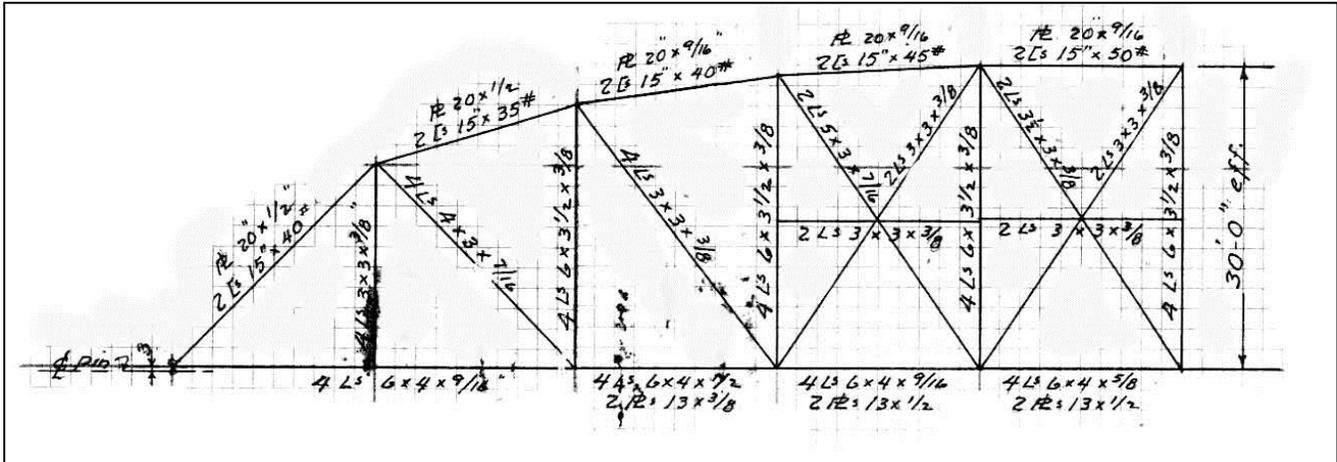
Hinsdale 042/044, "Hinsdale Bridge" (1926). NHHD sketch made from inspection June 11, 1941 showing half-elevation of truss (NHHD Bridge Inventory Card).
